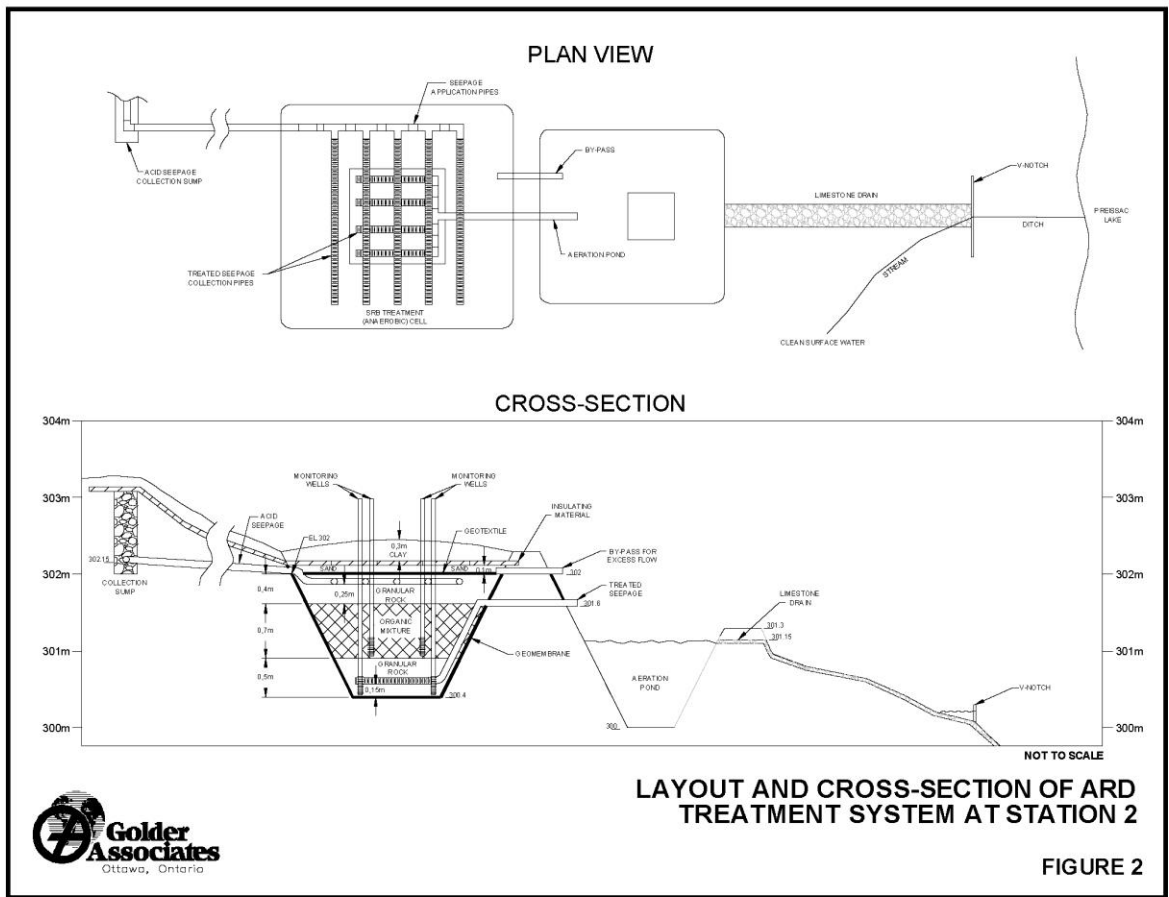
Layout and Cross-Section of ARD Treatment System at Station 2
